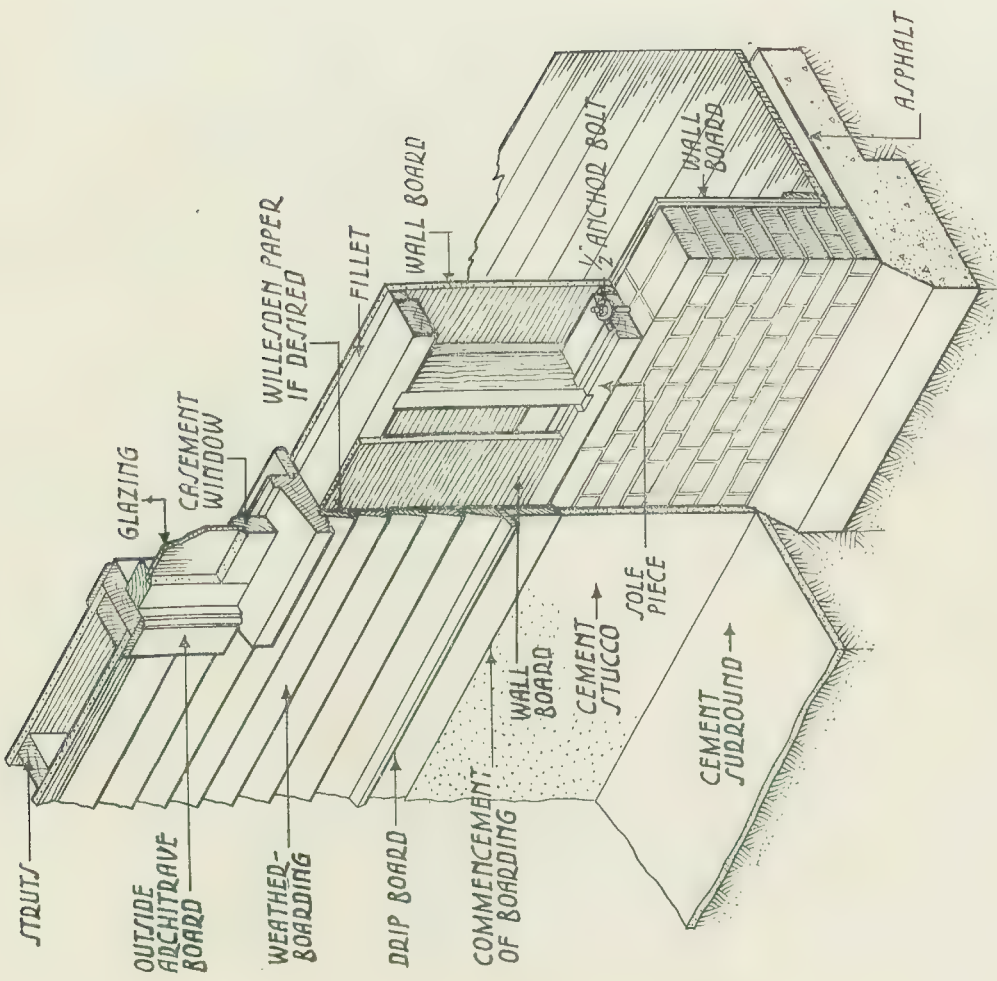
TIMBER FRAME CONSTRUCTION IN CONJUNCTION WITH A CONCRETE GROUND FLOOR
